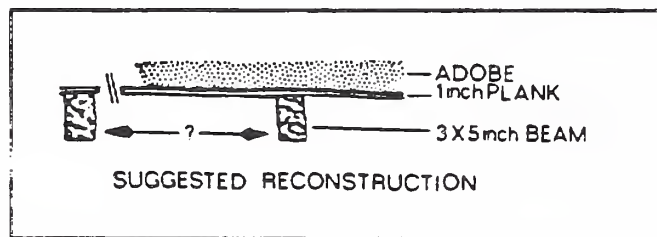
Suggested reconstruction of Test Pit 3 roof.
